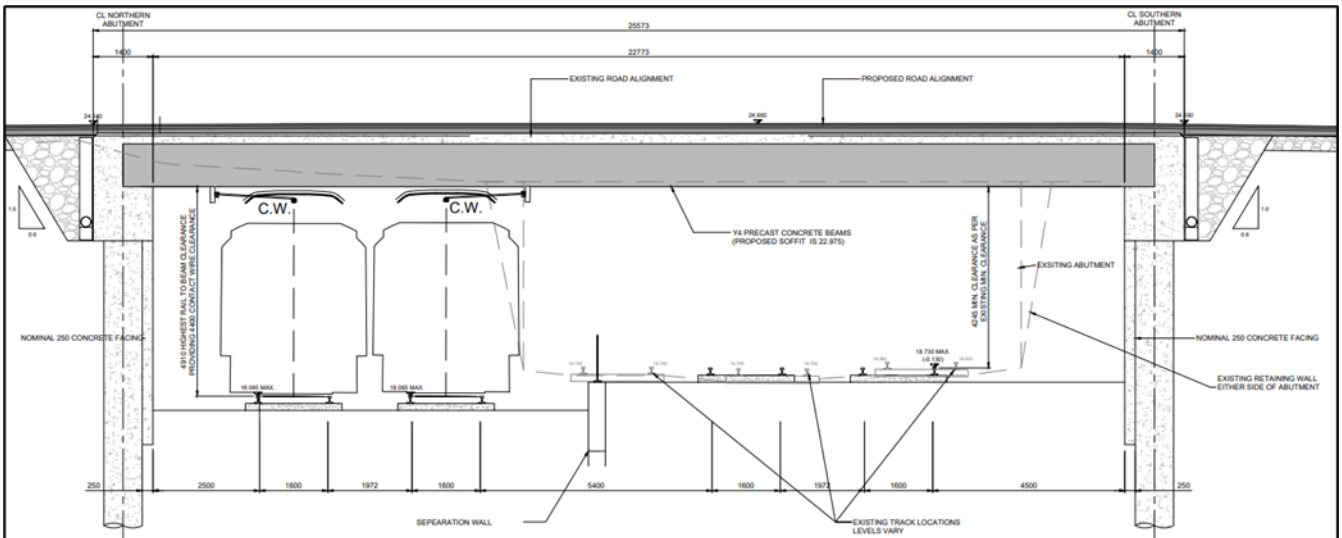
Proposed Memorial Road Bridge Cross Section
